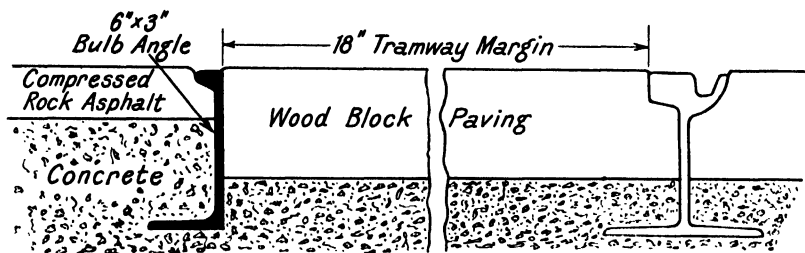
Bulb Angle isolating Road Breast from Tramway Track.
